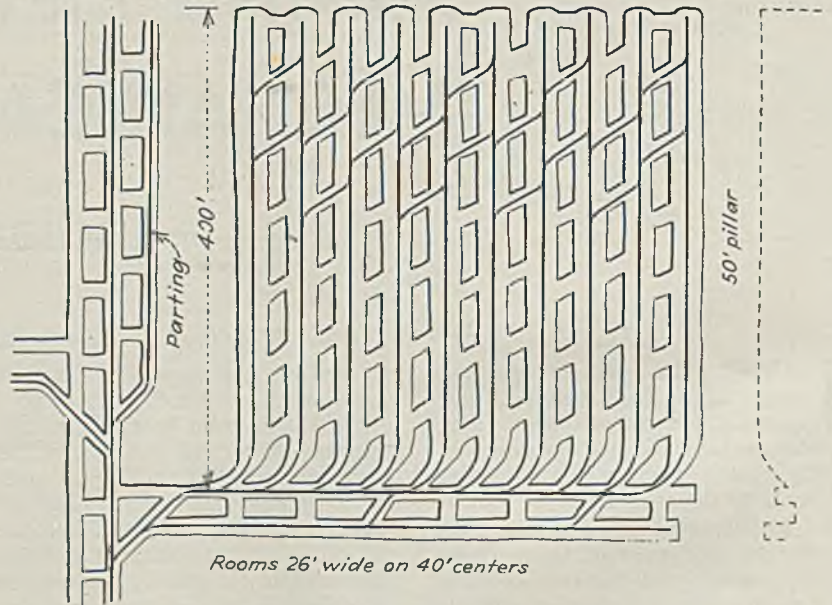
Ten-room panel at Glendora, showing use of 45-deg. necks and also the practice of connecting track through all crosscuts to cut changing distance
